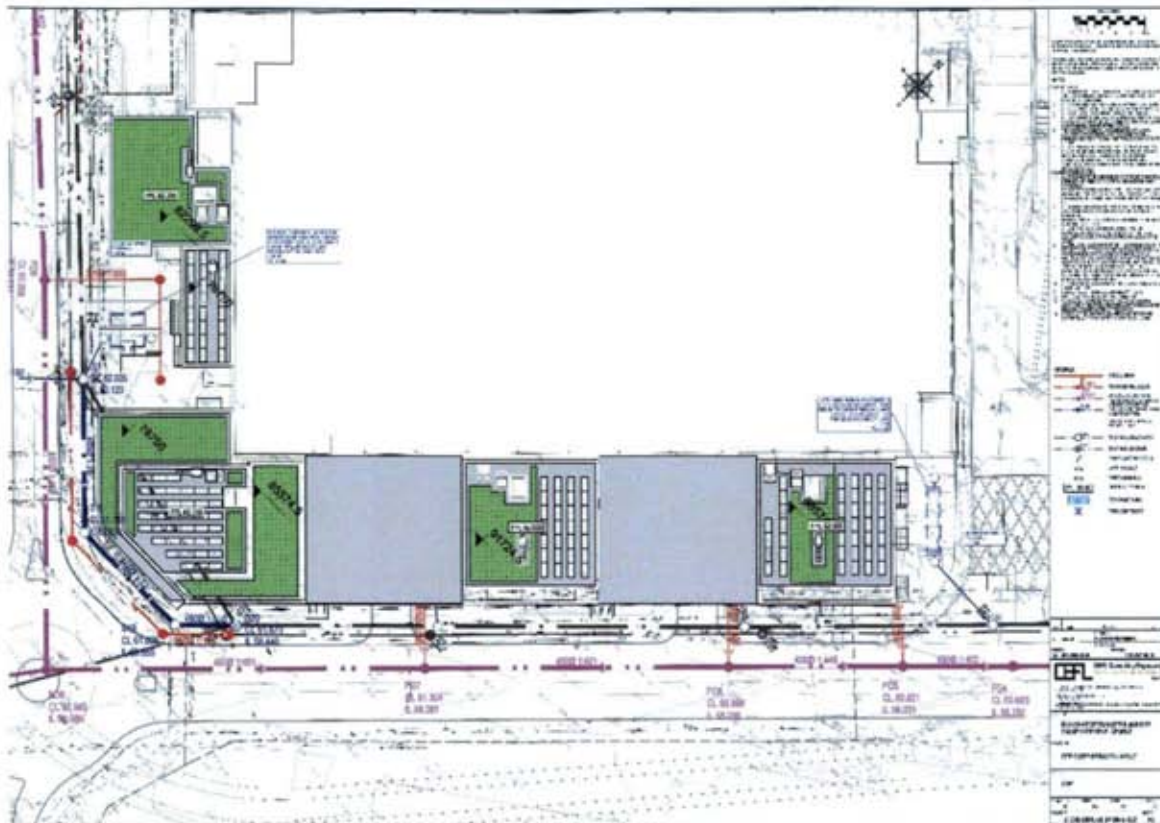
Site C Site Services Layout (210048-DBFL-CS-SP-DR-C-1321 Site C Site Services Layout)
